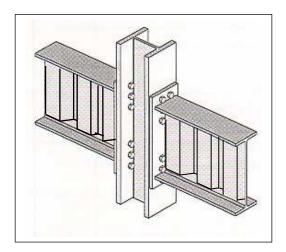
Typical extended end-plate connection of TWP beam section connected to British Hot-Rolled section.
